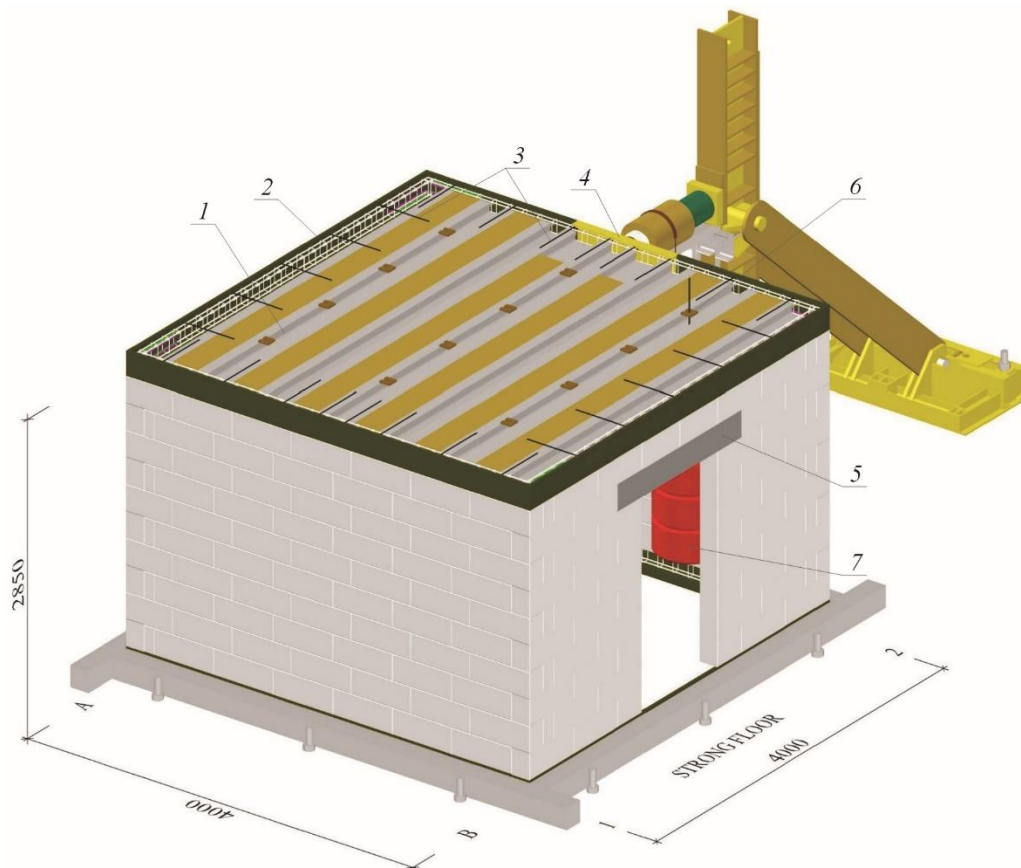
Research model in the test stand: 1 – prestressed precast slab panel, 2 – reinforcement of the top ring beam, 3 – top reinforcement of the slab, 4 – steel C-profile, 5 – precast lintel, 6 – load suspension points, 7 – visible weights.
